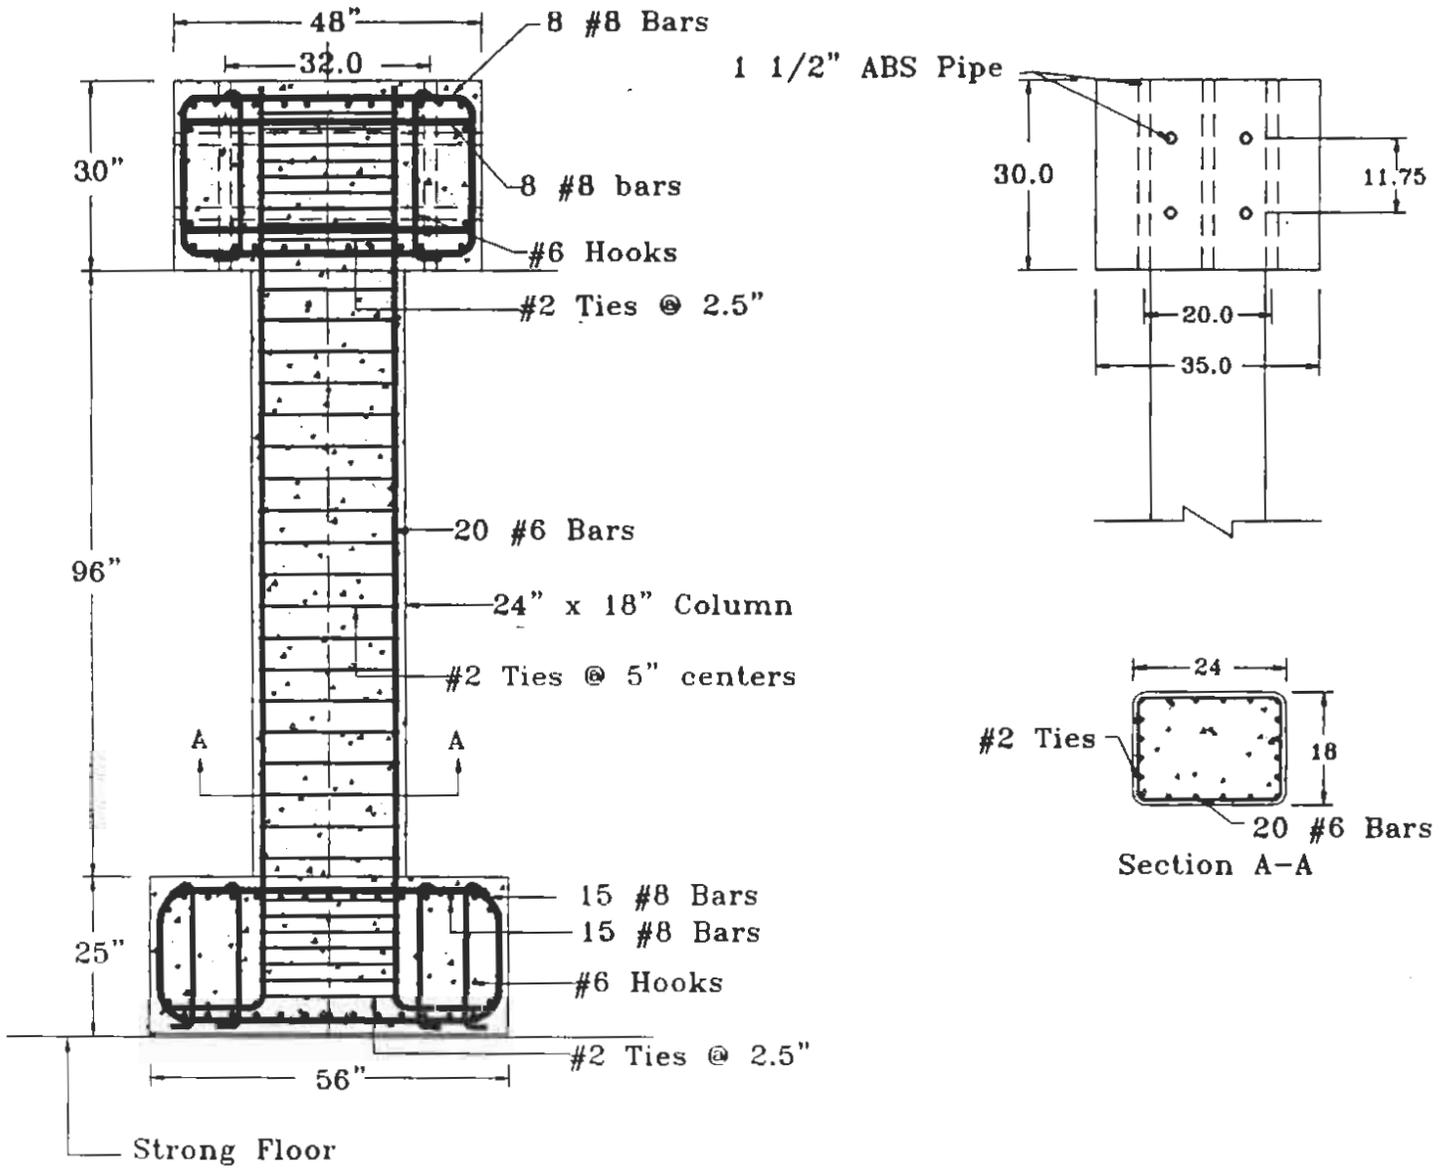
Reinforcement Details for Shear Enhancement Rectangular Columns
